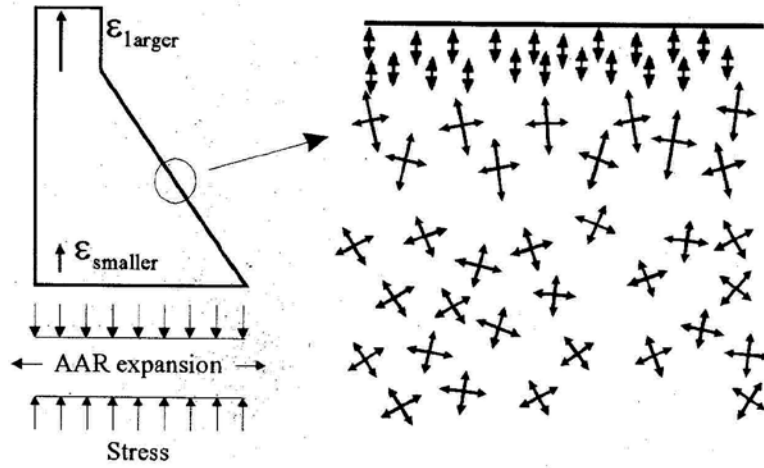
Sketch of cracking on the downstream face of a gravity dam affected by expansive reactions
